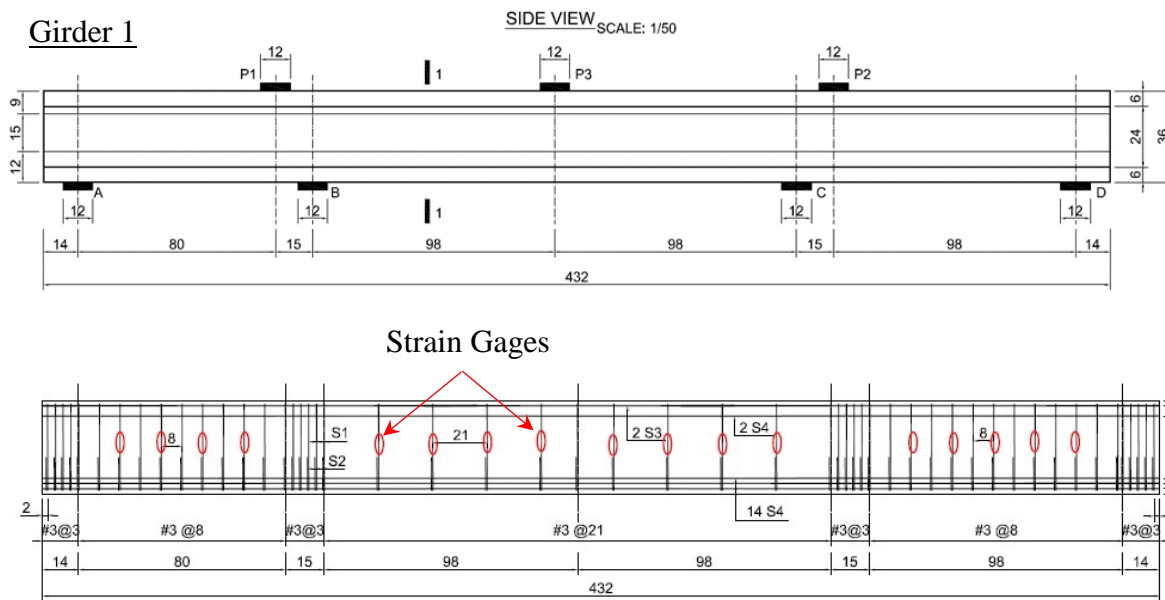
Girder 1 layout and strain gage location (dimensions in inches)
